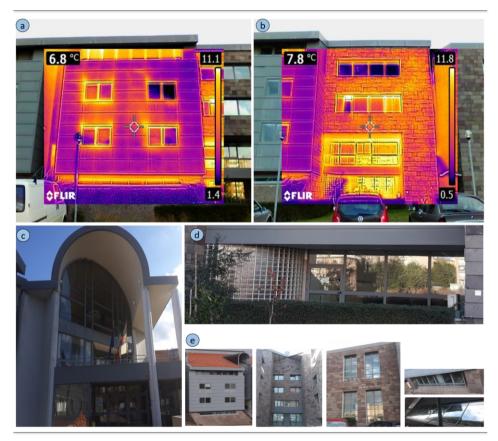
Building envelope: a) Wall with aluminium panel; b) Wall with porfido stone; c) glass walls; d) Glass blocks; d) others window types
